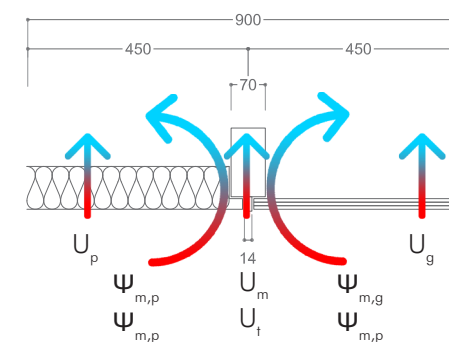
Enlarged plan view showing U & Ψ - values exchange through typical curtain wall for selected case (Source – Author)
